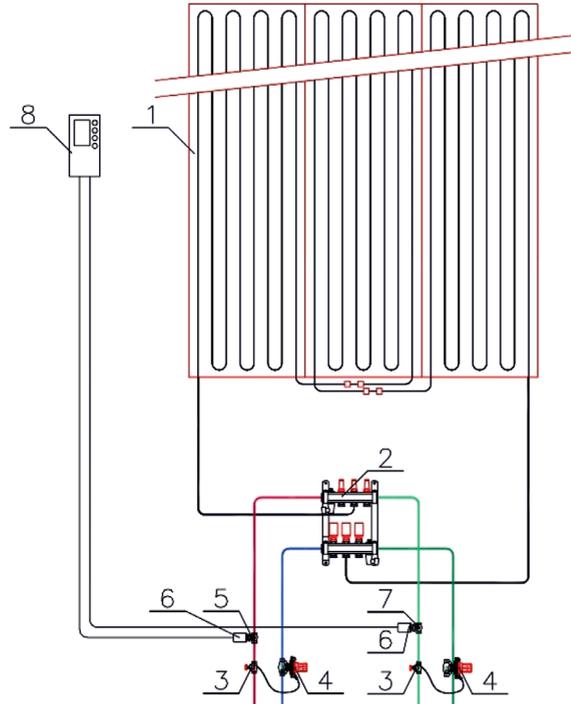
Example of heating and cooling combined into one system [29]; 1 – wall panel, 2 – manifold, 3 – balancing valve, 4 – differential pressure regulator, 5 and 7 – thermostatic valves, 6 – thermal actuator, 8 – controller
